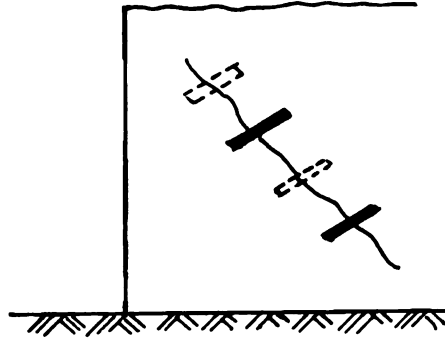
Repair of cracks in masonry by stitching with steel rods.
